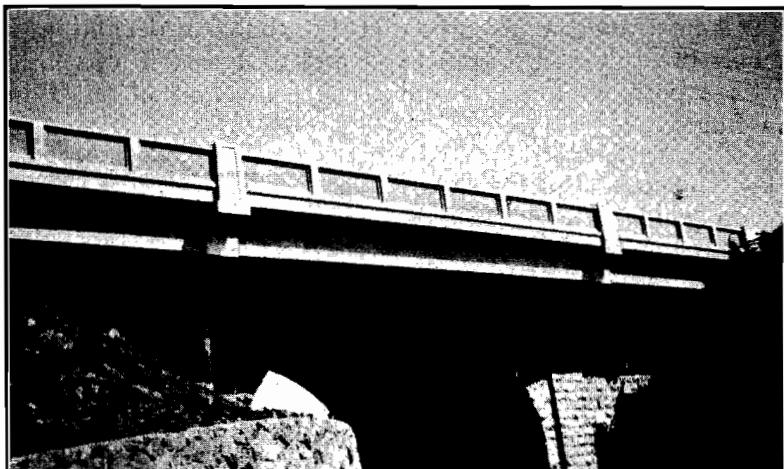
Showing bridge on the Main Heidelberg Road after completion of widening.
